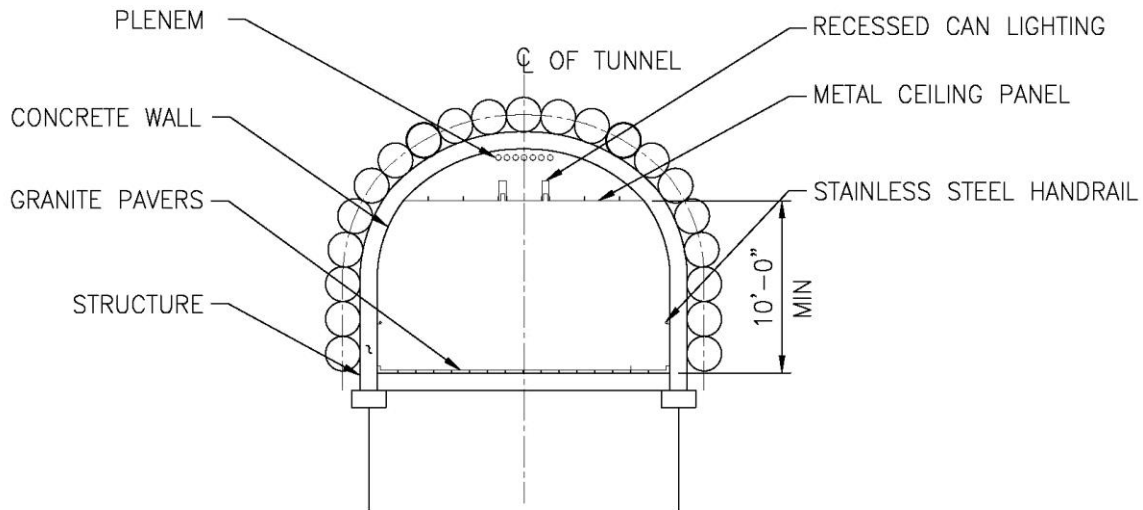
Jacked Tunnel Box with Cavity Wall Section
